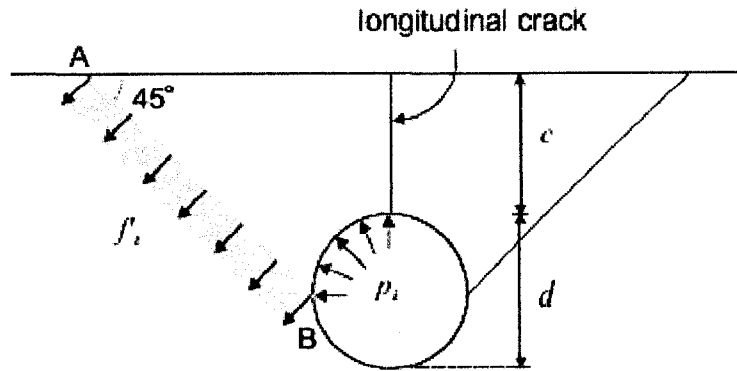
Spalling failure of concrete at 45°-plane (Martín-Pérez, 1999)
